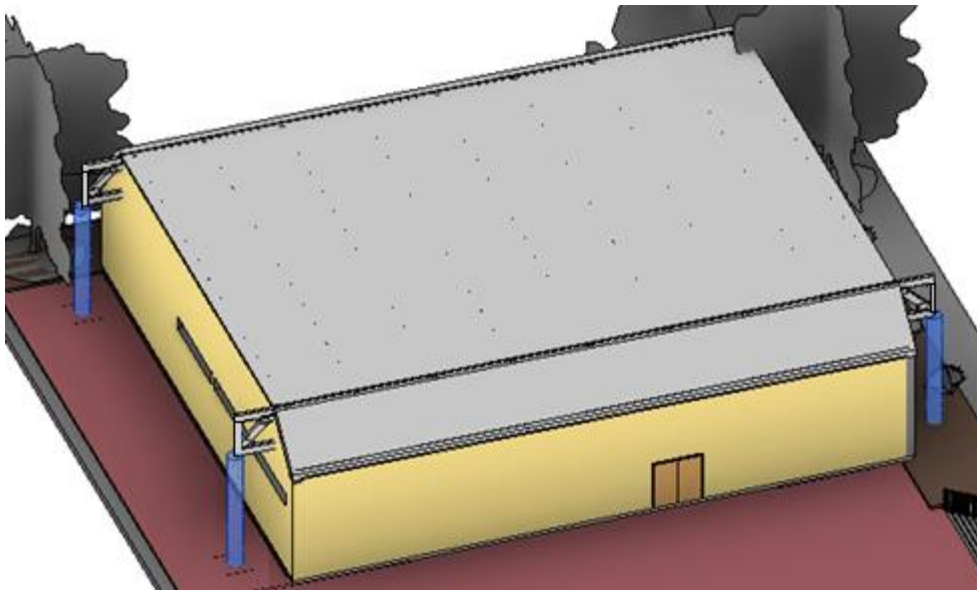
A 3D capture of the renovated MCC, highlighting the exterior concrete columns.
